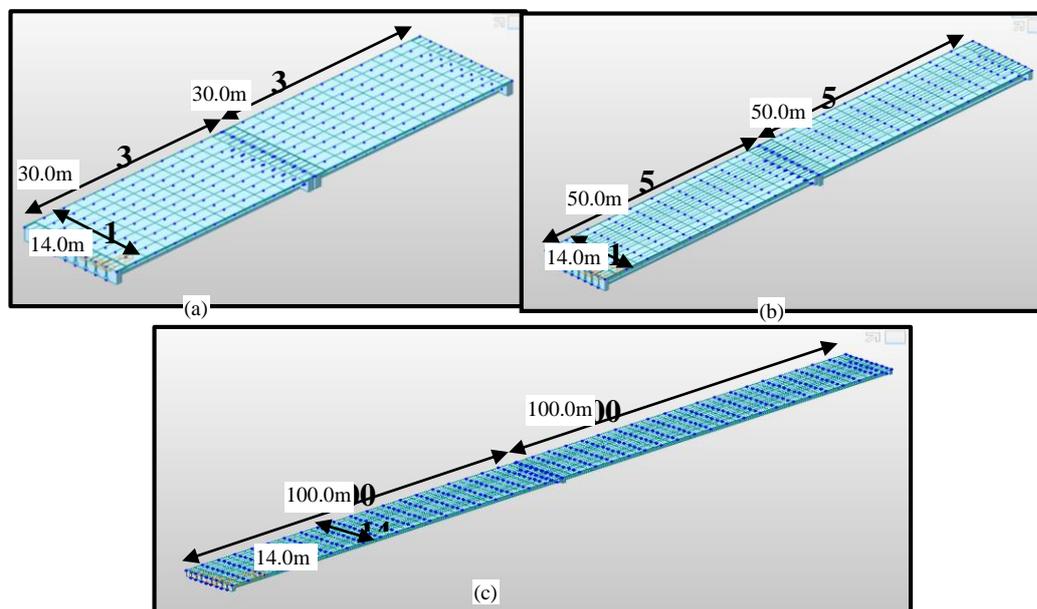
Simple two-span beam bridge deck of 14.0m wide and the grillage model of the bridge deck for (a) 30m each (b) 50m each and (c) 100m each span respectively
